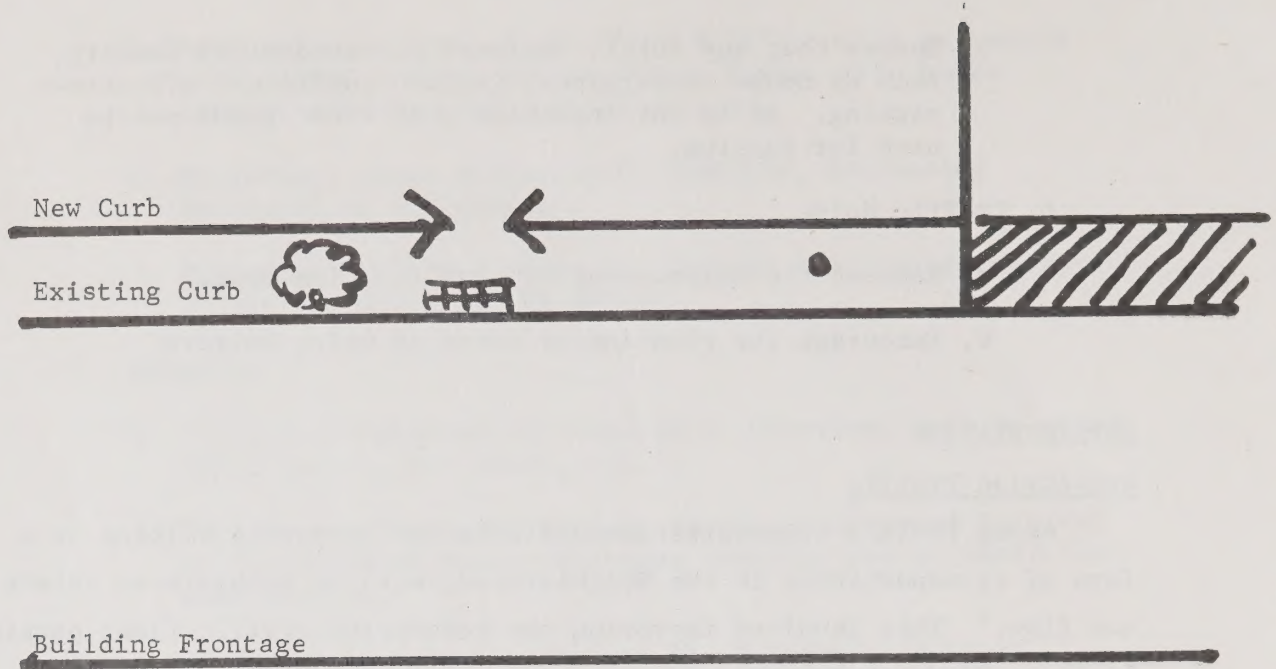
Creating more sidewalk space by building new curb and moving trees, parking meters, etc. to the new space.
